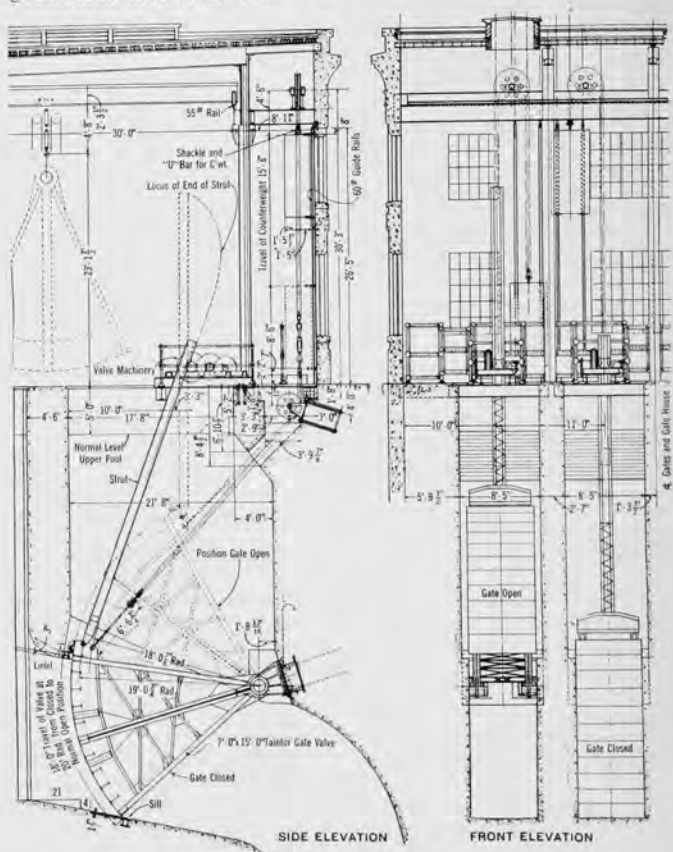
WELLAND SHIP CANAL: GENERAL ARRANGEMENT OF TAINTOR INTAKE VALVES AND OPERATING MACHINERY.
